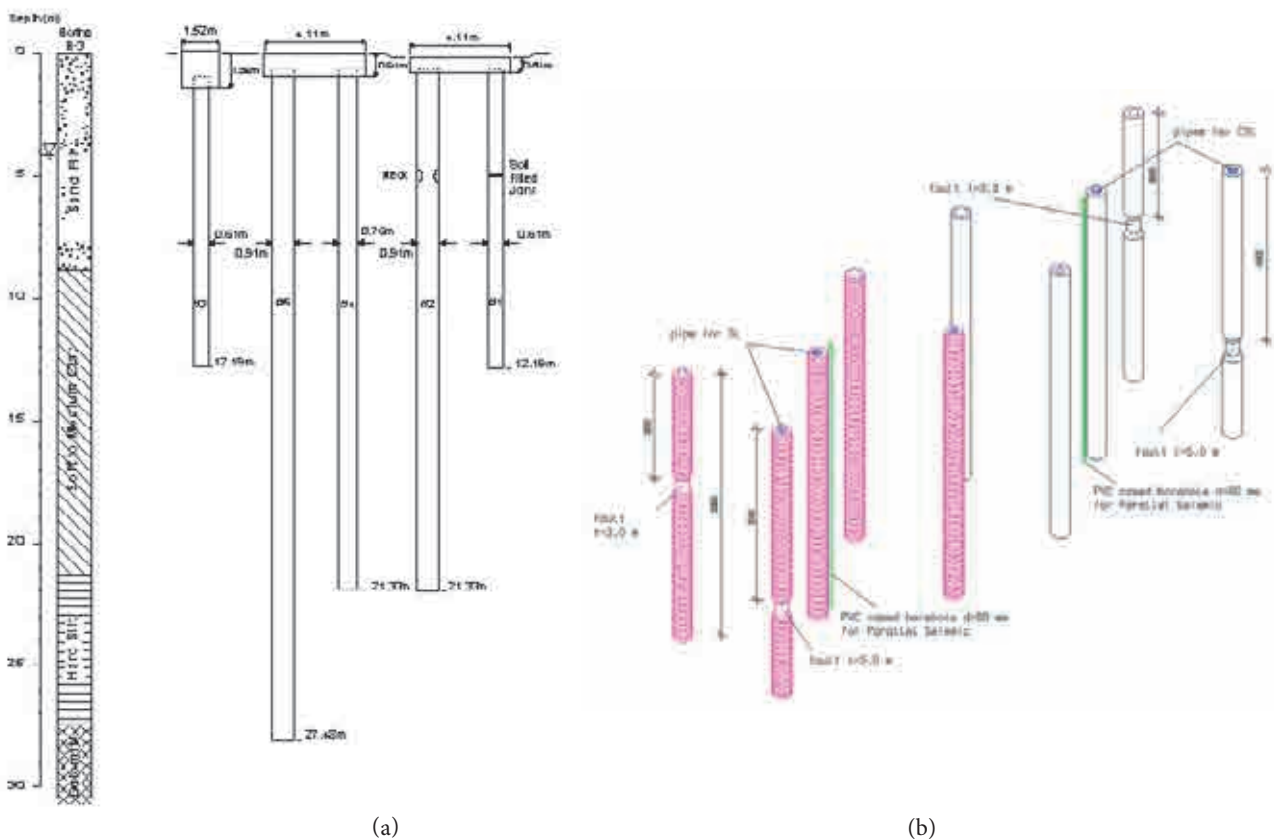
Large scale deep foundation test facilities: (a) schematic of National Geotechnical Experimental Station site; (b) schematic of Horstwalde, Germany site ([471] and [474], respectively).
